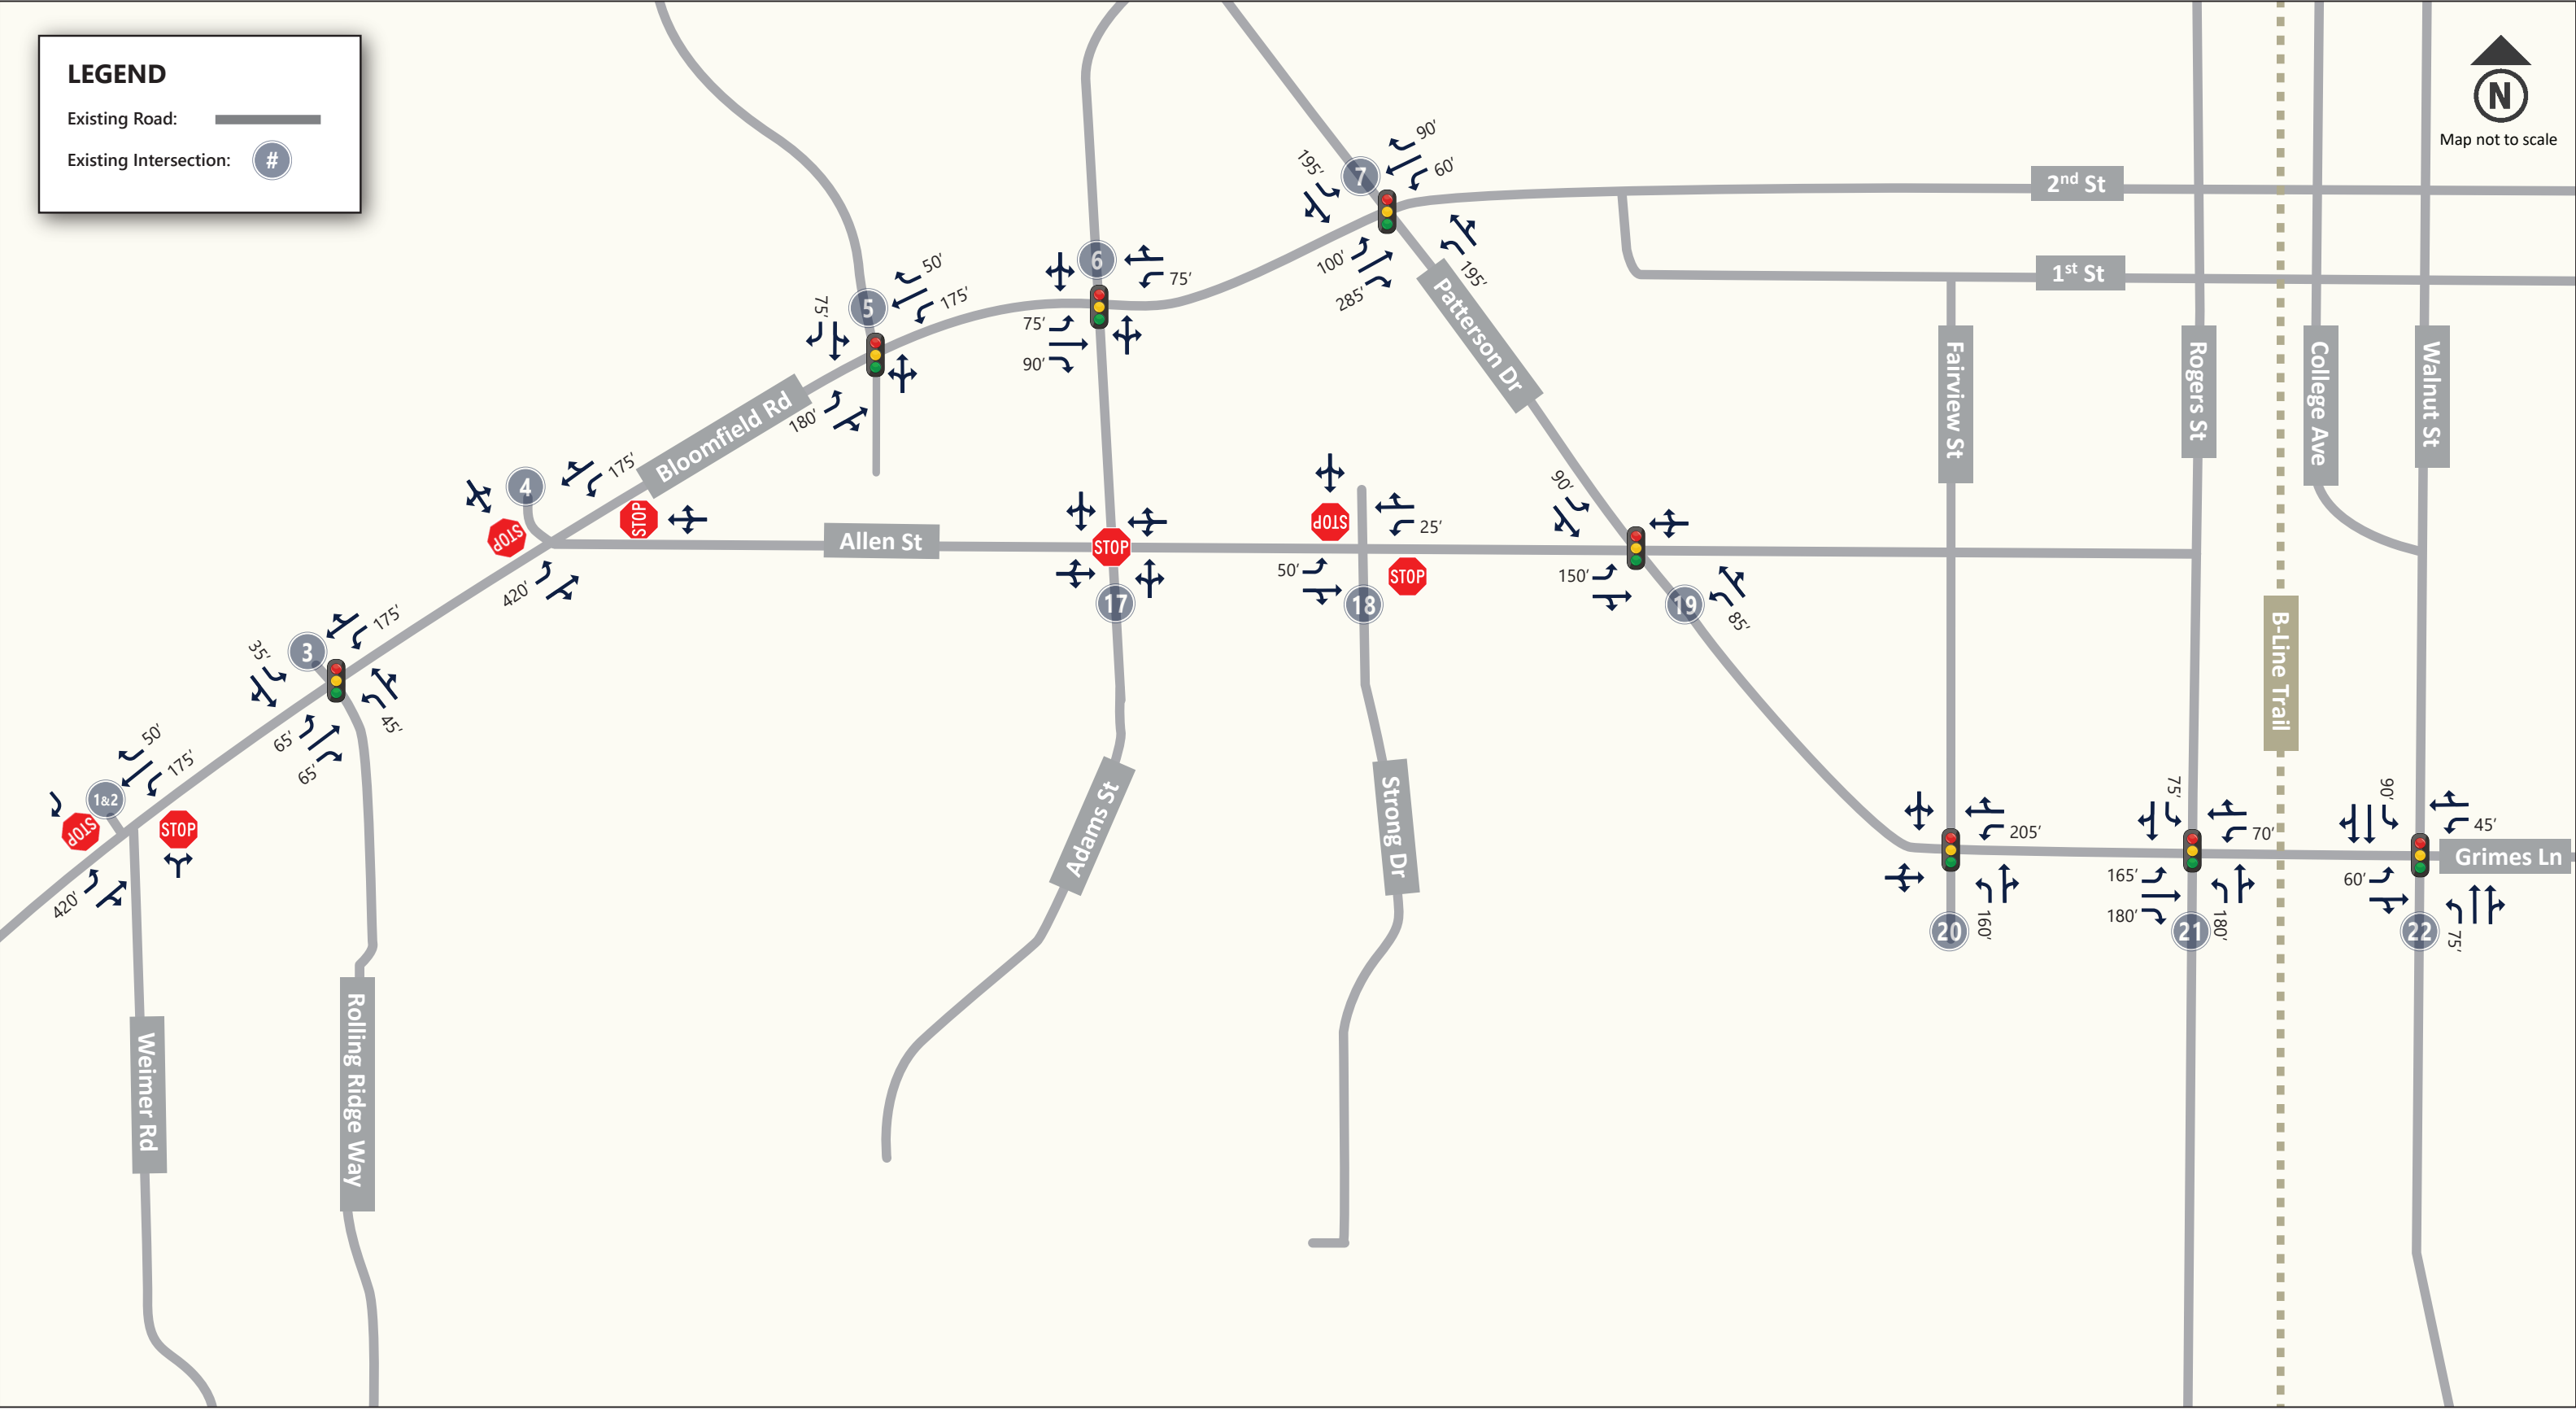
Existing Intersection Geometries: Bloomfield Road / 2nd Street, Allen Street, and Patterson Street
